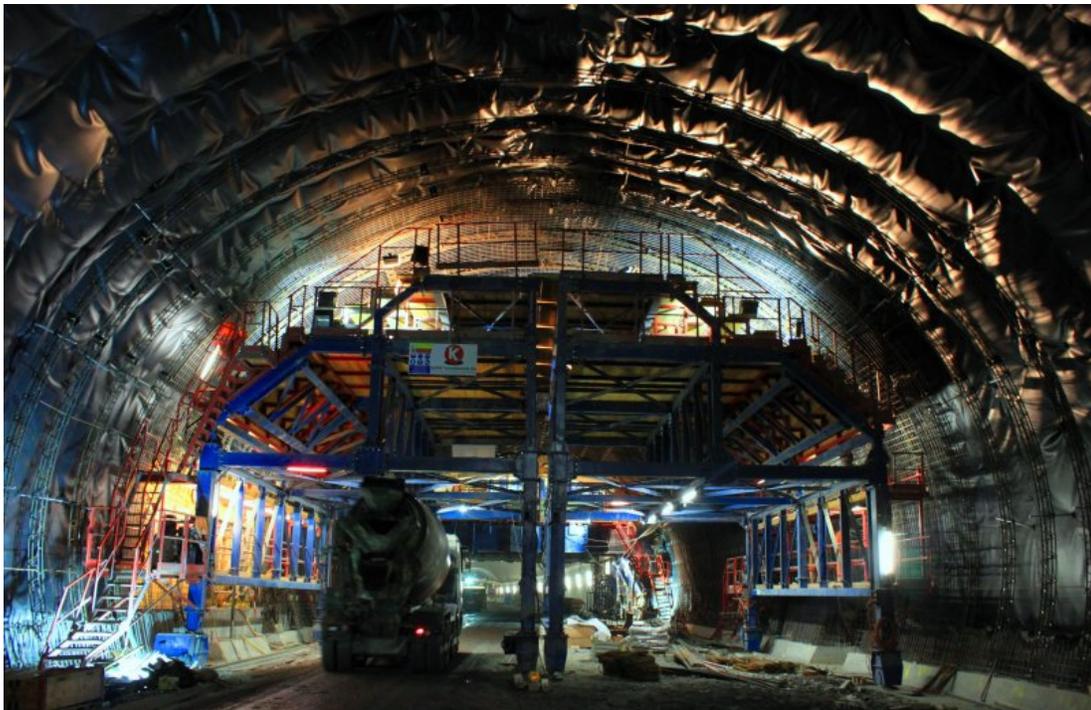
Movable Frame for Installation of Waterproofing Membrane and Sprayed Shotcrete (Reference 2)
